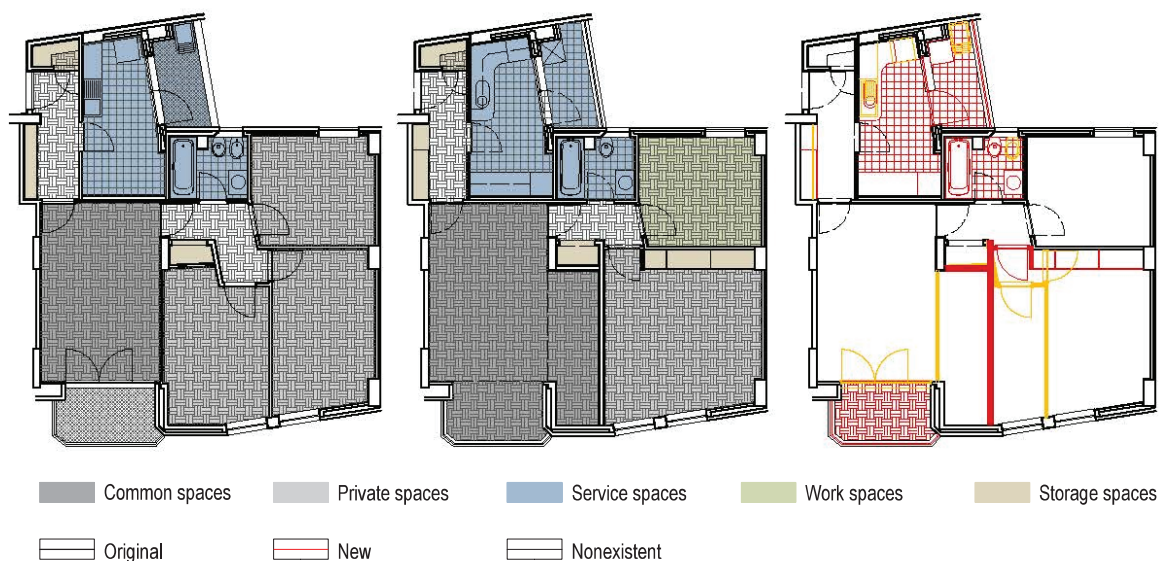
(apartment 2, typology A, 13th floor). Floor plans: original, current and alterations. Scale 1:200
